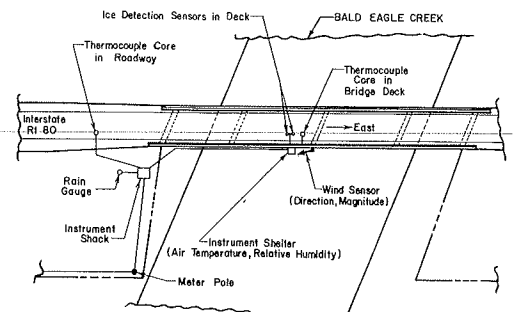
Plan view of instrumented bridge deck showing sensor locations.
